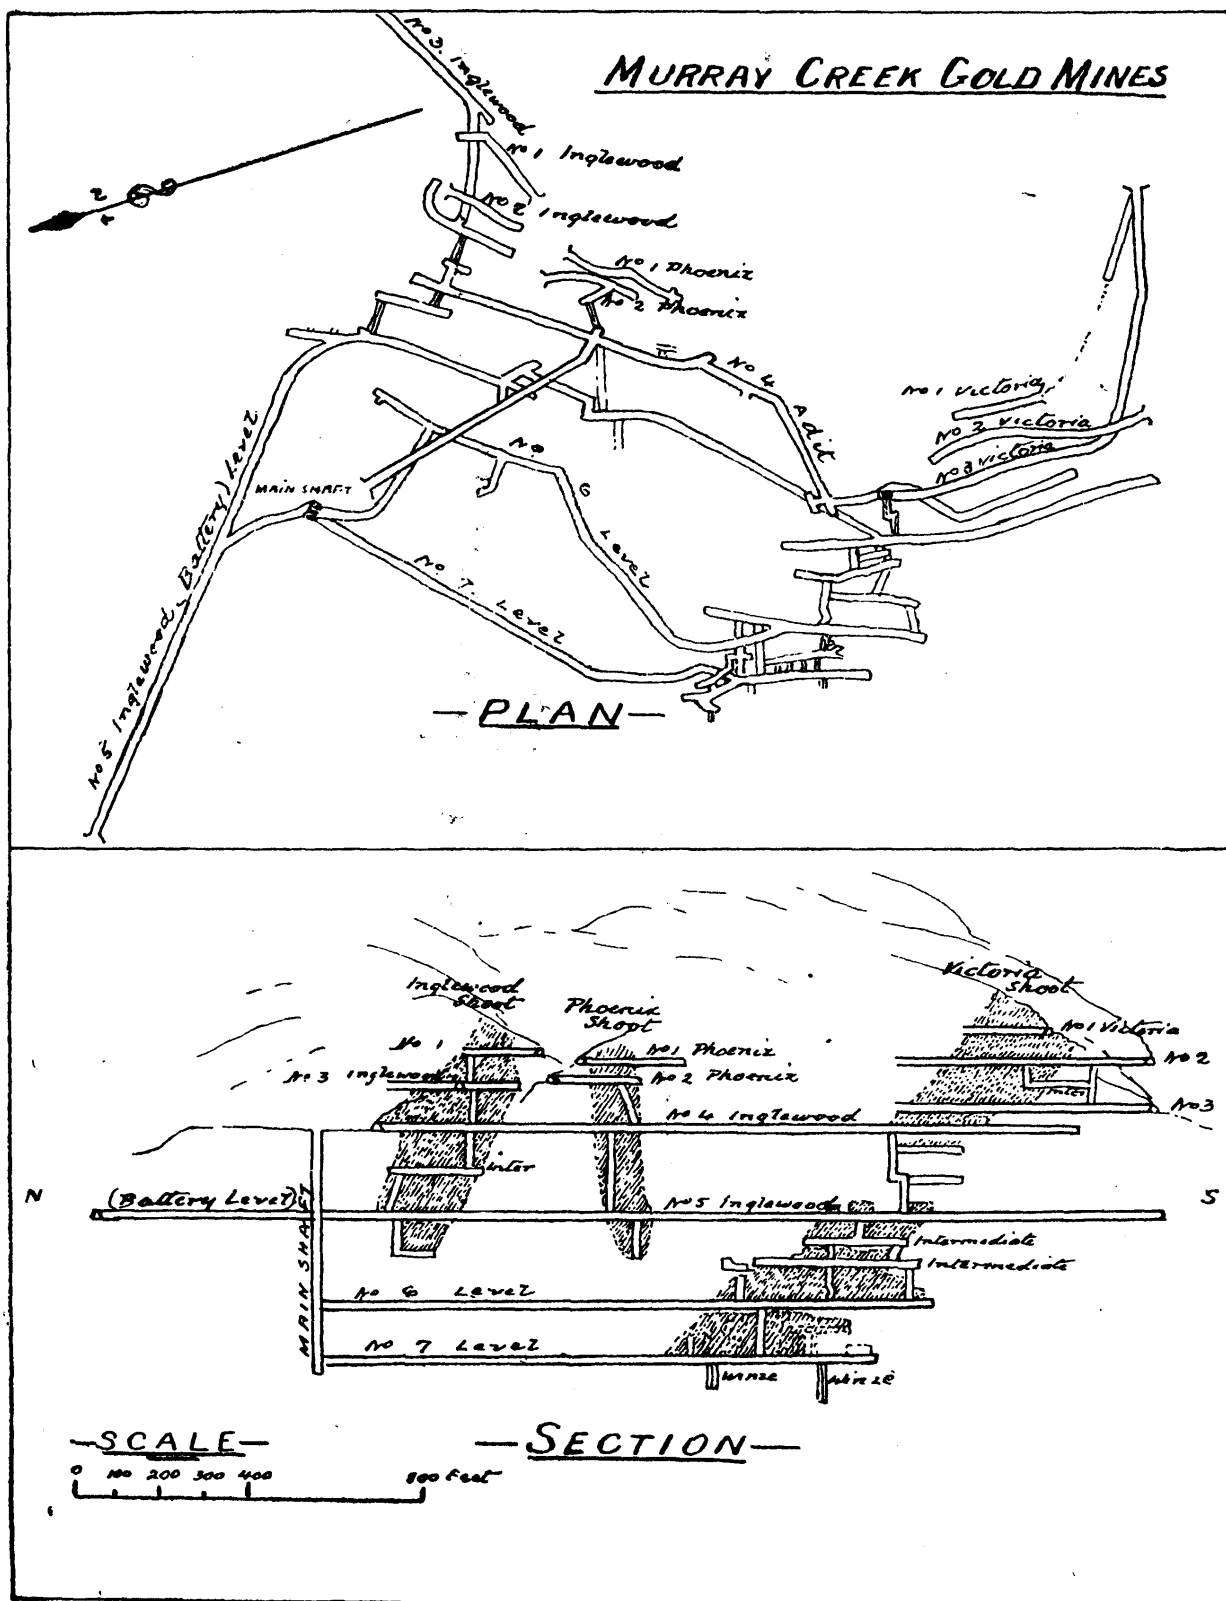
PLAN AND SECTION OF MURRAY CREEK MINES, REEFTON.
